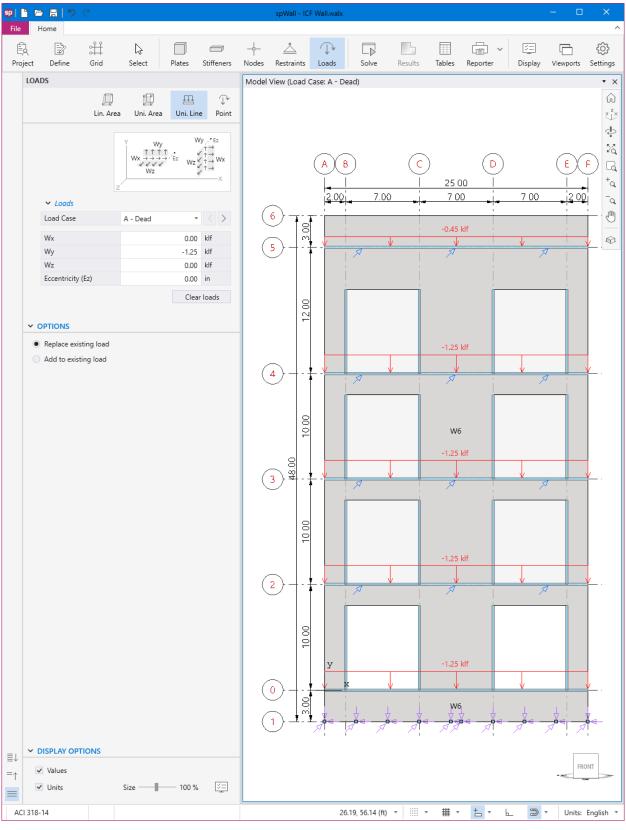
Assigning Roof and Floor Dead Loads (spWall)
